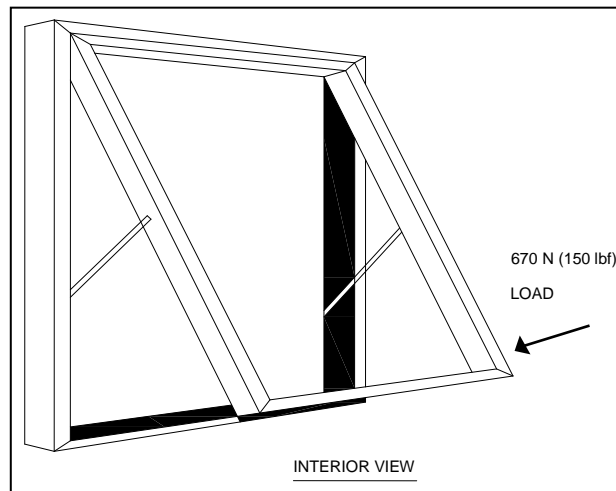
Top Hinged Inswing Window- Hold Open Arm/Stay Bar Test
